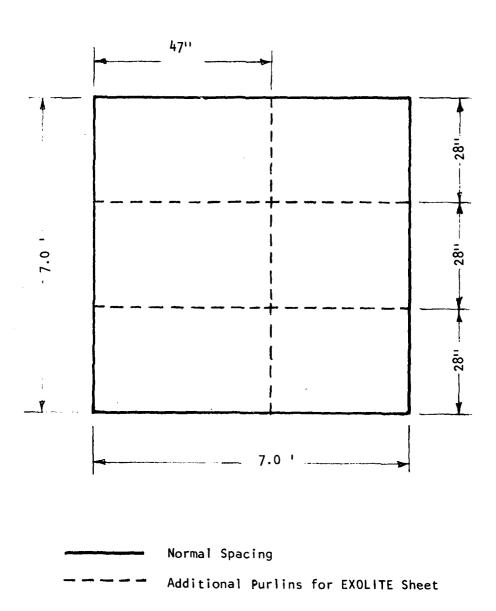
PURLIN SPACING FOR THE TANK ROOF
